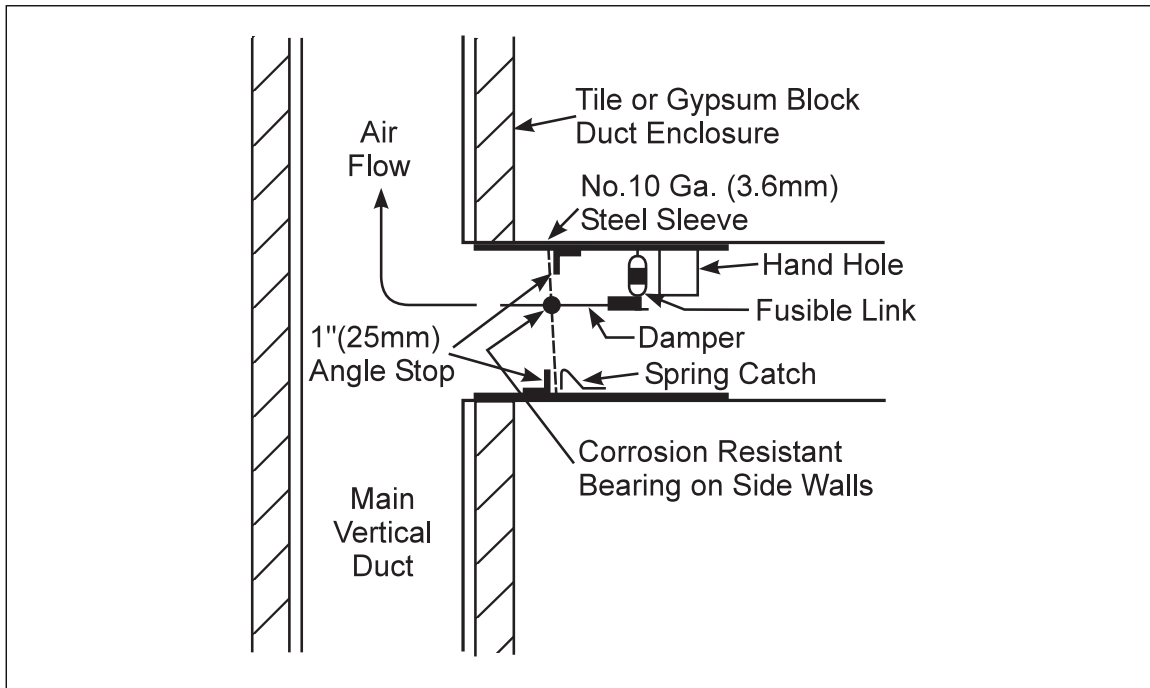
Automatic hinged damper at junction of branch duct with main vertical duct.
